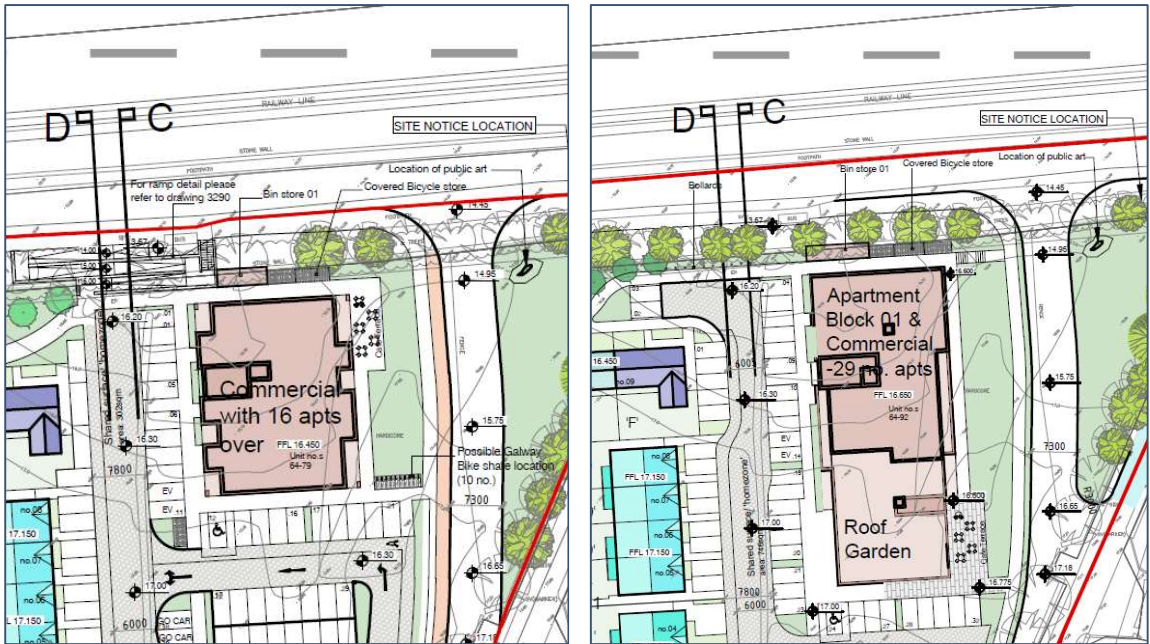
Stage 2 Ramp detail and Pedestrian Connections and Figure 2-15: Stage 3 Pedestrian Connections
